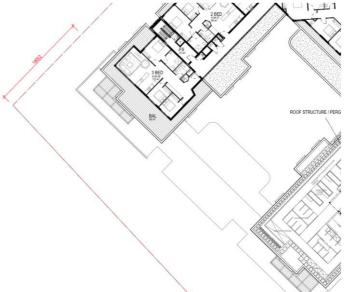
Extract DA114B Level 4 – Building A 18.052m setback.
